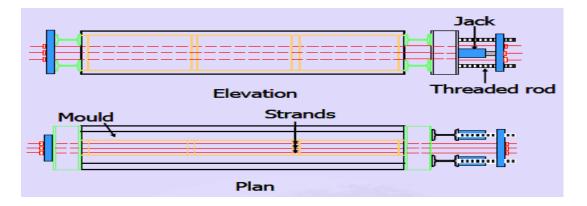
Elevation & Plan showing strands profile of I Girder before casting concrete ("Referred from Prestressed Concrete Structures by Dr. AK Sengupta and Prof. Devdas Menon")
